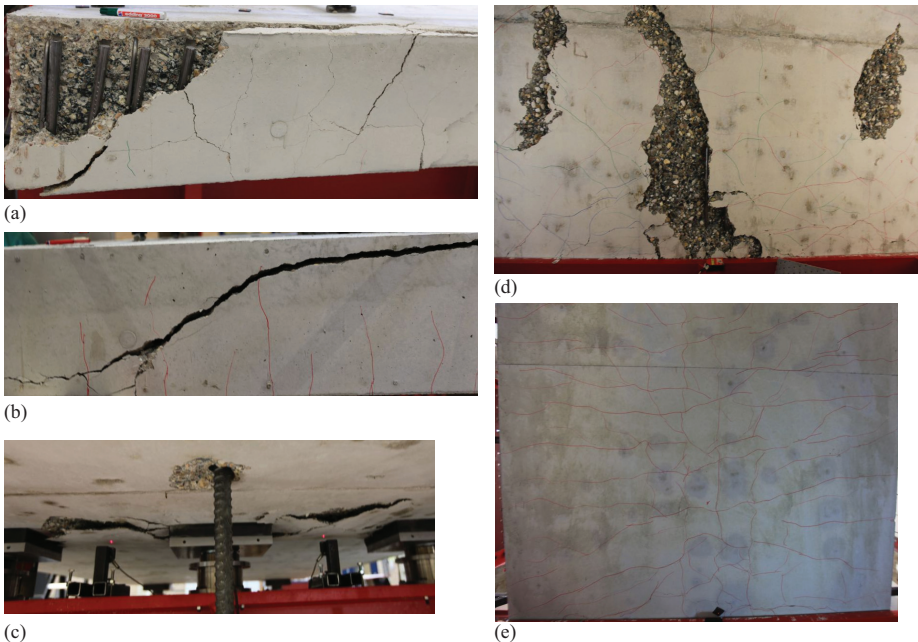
(a) A: Anchorage failure (S11T3); (b) B: shear crack at the side face (BL3T1); (c) SF: failure at the support (S17T1); (d) P: partial punching at the bottom face (S14T6); (e) WB crack pattern: inclined cracks on the bottom face (BL3T1)
